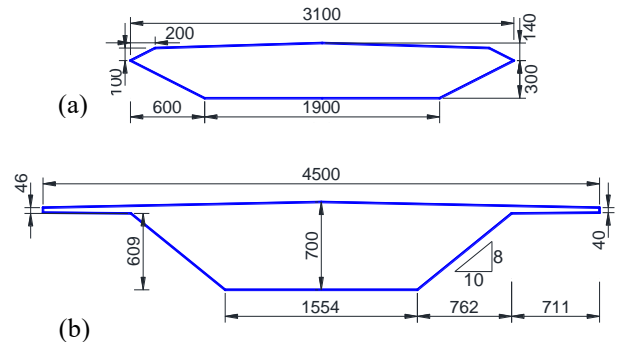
Two-dimensional bridge deck sections (unit: cm): (a) section A, streamlined shape, and (b) section B, bluff shape
